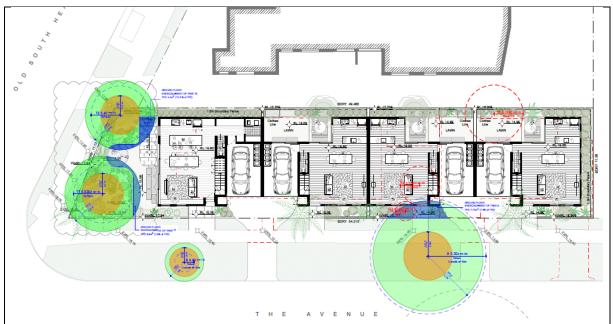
The amended landscape design, maintaining trees T1 and T2 within the front setback.
